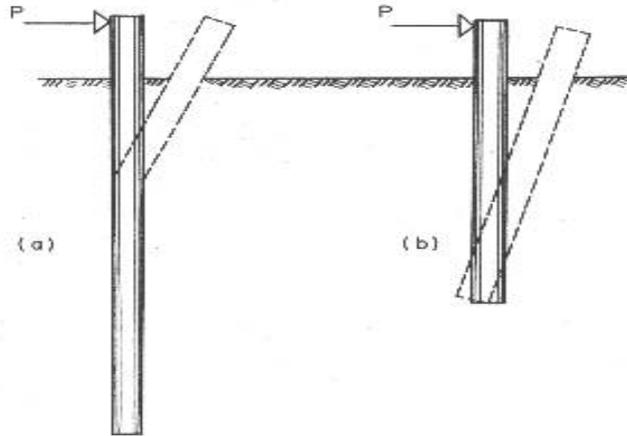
Failure Modes for Short and Long Piles (Broms 1964a)
